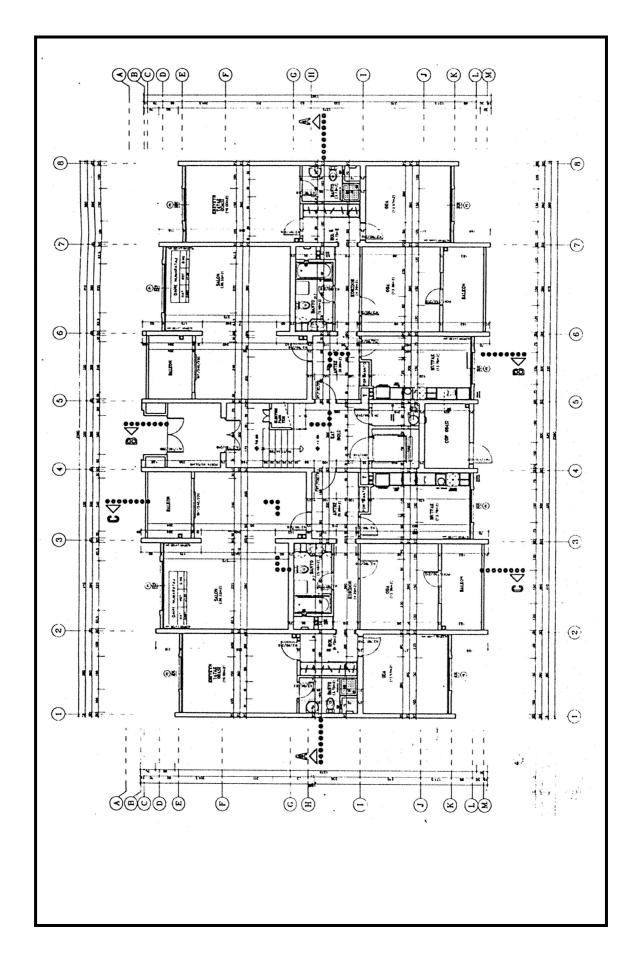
Mavişehir II; C Apartment Building Ground–Floor Plan
